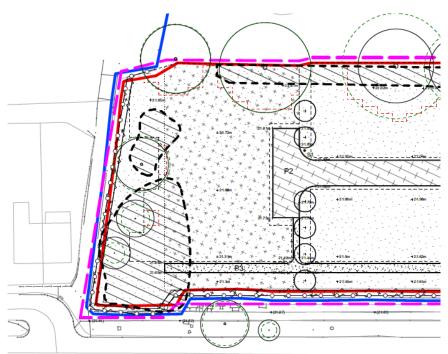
Approved layout under the original planning permission ref. no.17/03256/RE4
